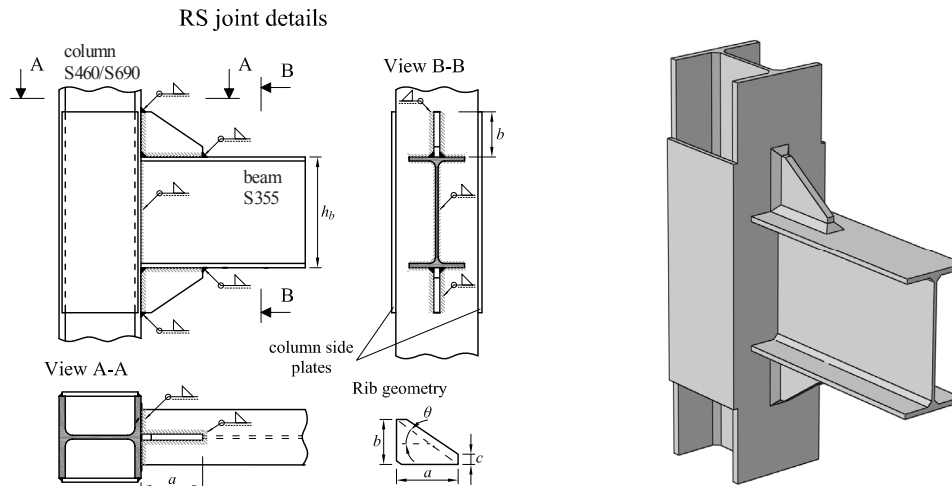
Welded RS beam-to-column joint details (concrete column encasement not illustrated)
